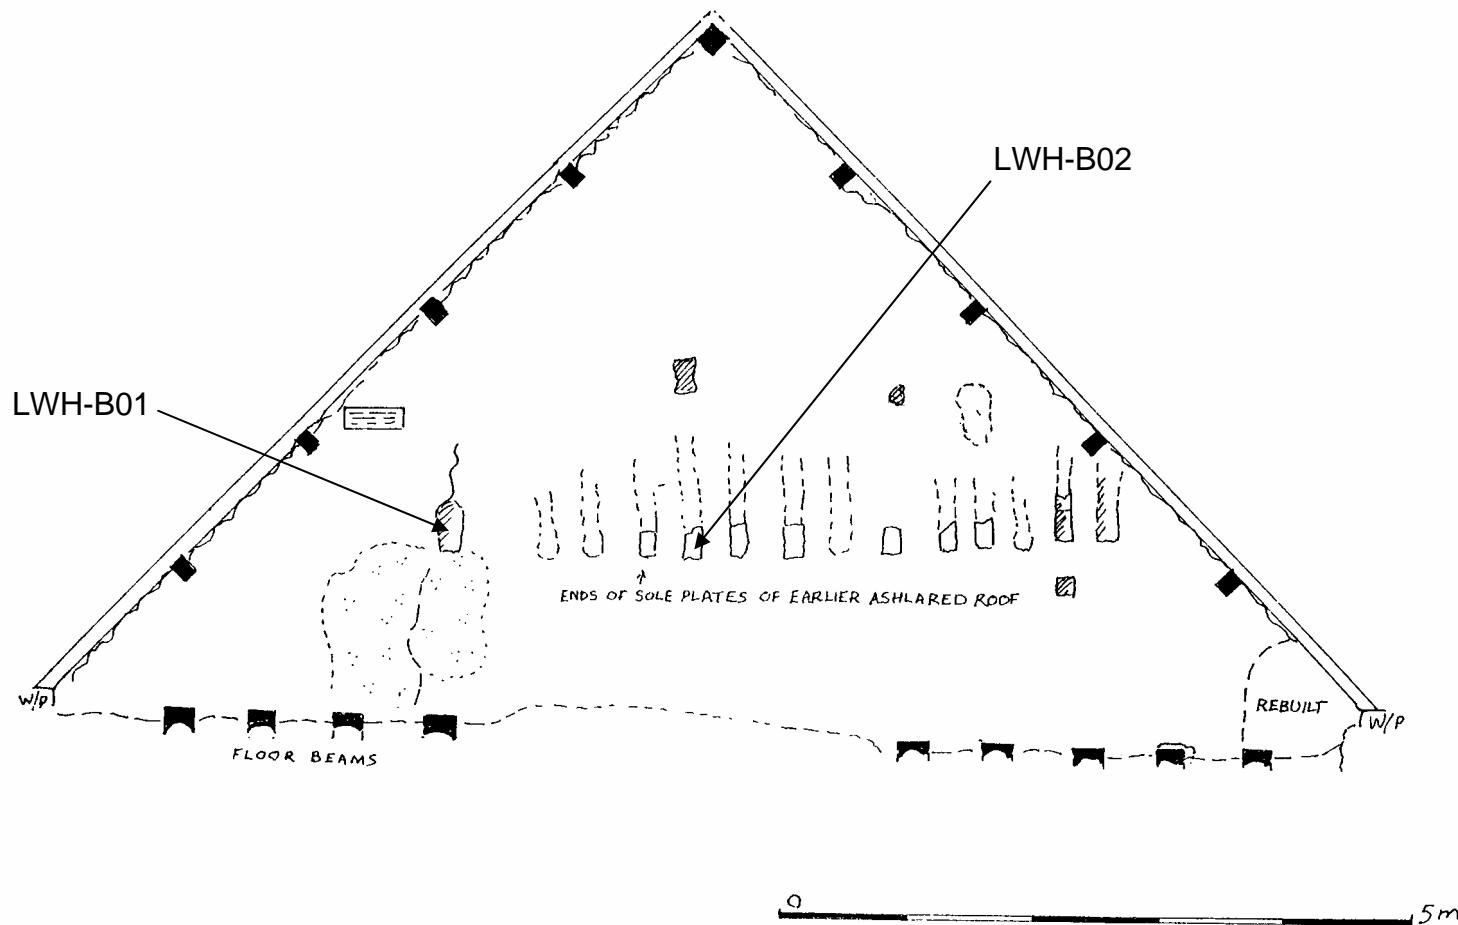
Low Harperley farmhouse; main building, east wing, west wall, showing the remains of the earlier common rafter roof (Peter Ryder)
